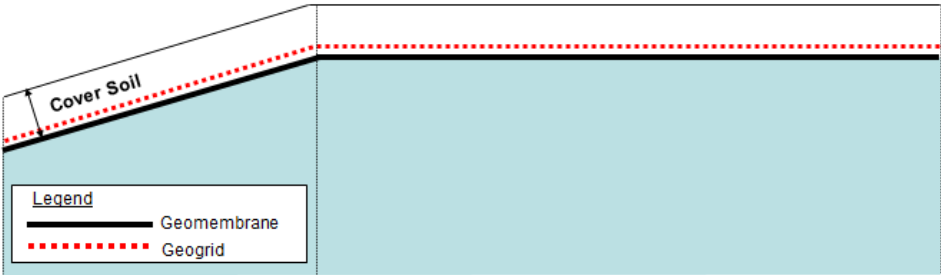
Horizontal anchorage of Geogrid at transition zone between slope & plateau
